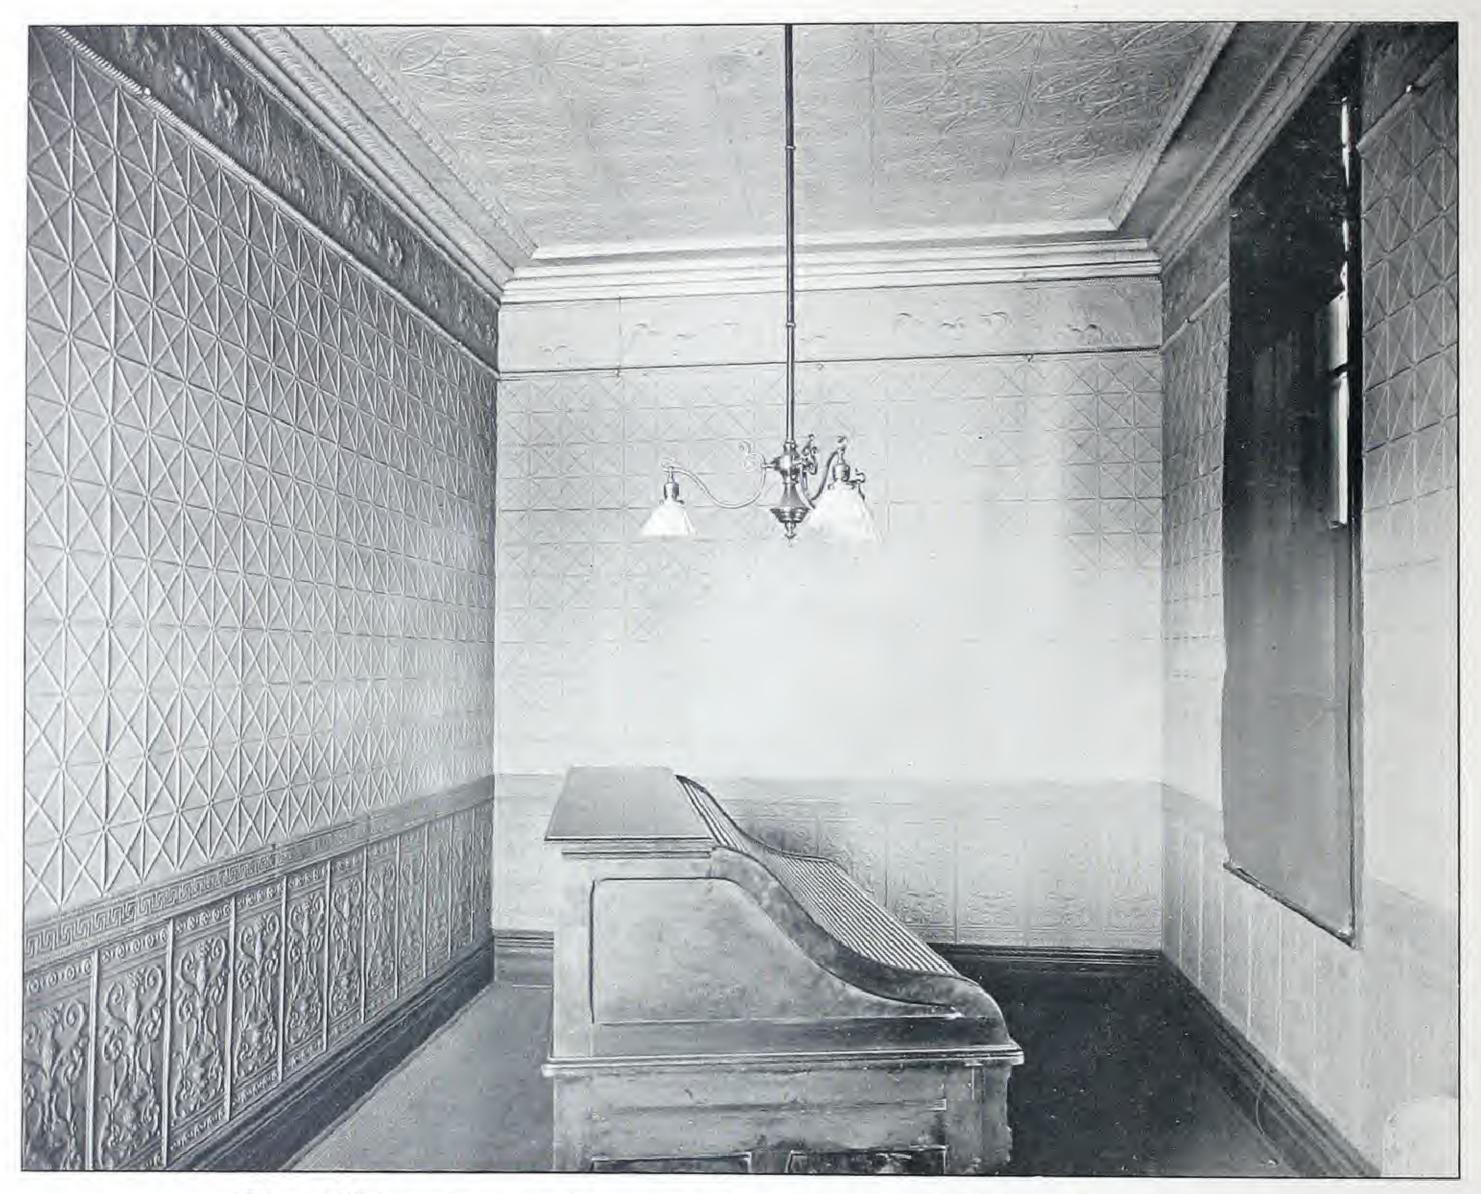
Ceiling and Walls in Private Office, Polson Iron Works Co., Toronto.
